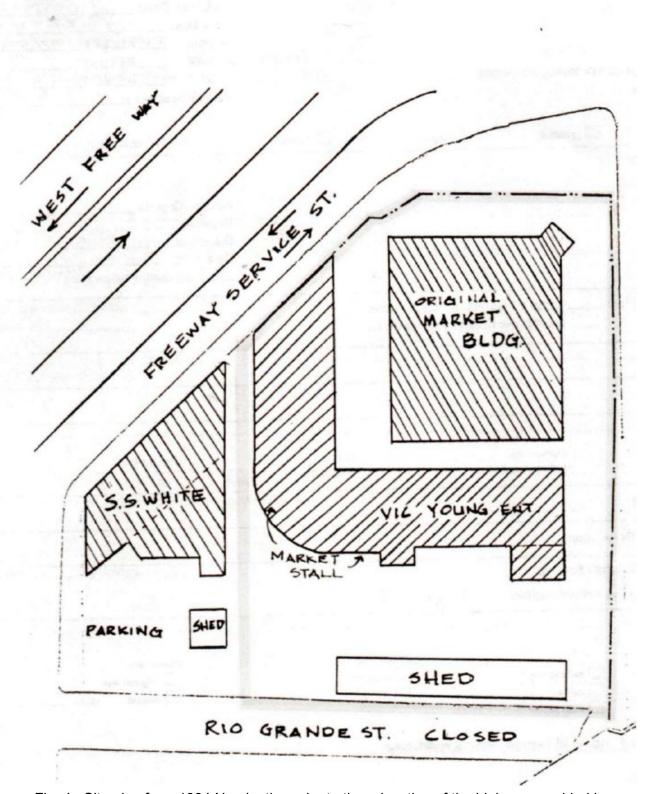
Site plan from 1984 Nomination prior to the relocation of the highway provided by applicant.
